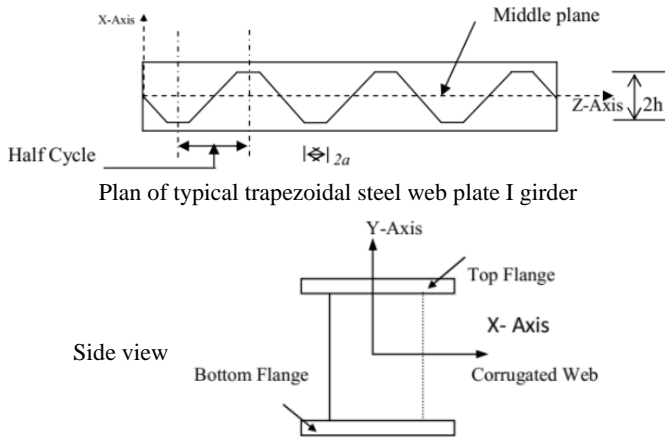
Plan and side view of typical trapezoidal steel web plate I girder.
